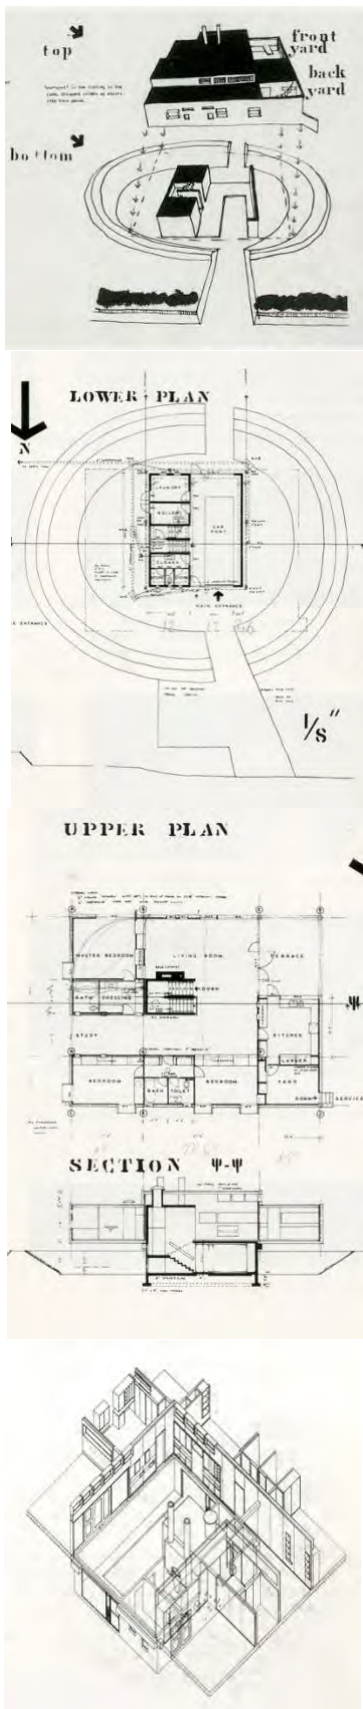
» Diagram, ground floor plan, and first floor plan of Bates' Burrows and axonometric of ground-floor and first-floor by Luiz Breda Neto and Peter Salter, extracted from the book *Charged Void: Architecture* by A.P. Smithson, 2000.
